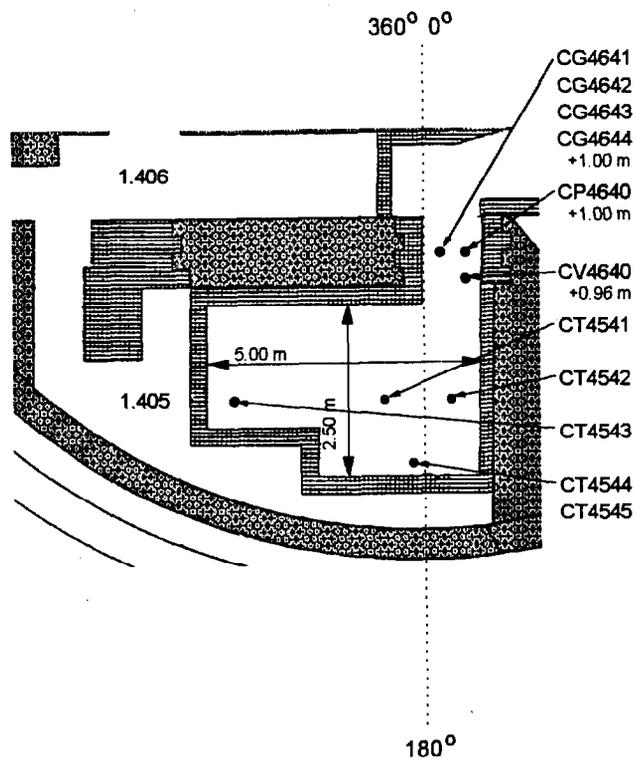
Fire Room at the +1.7 m Elevation for T51.19
